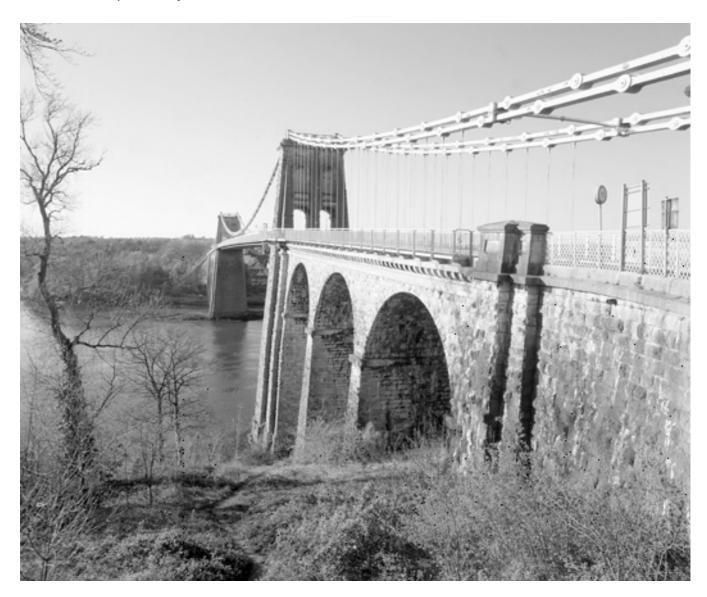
Menai Suspension Bridge looking north [251] (Ken Hoverd)
